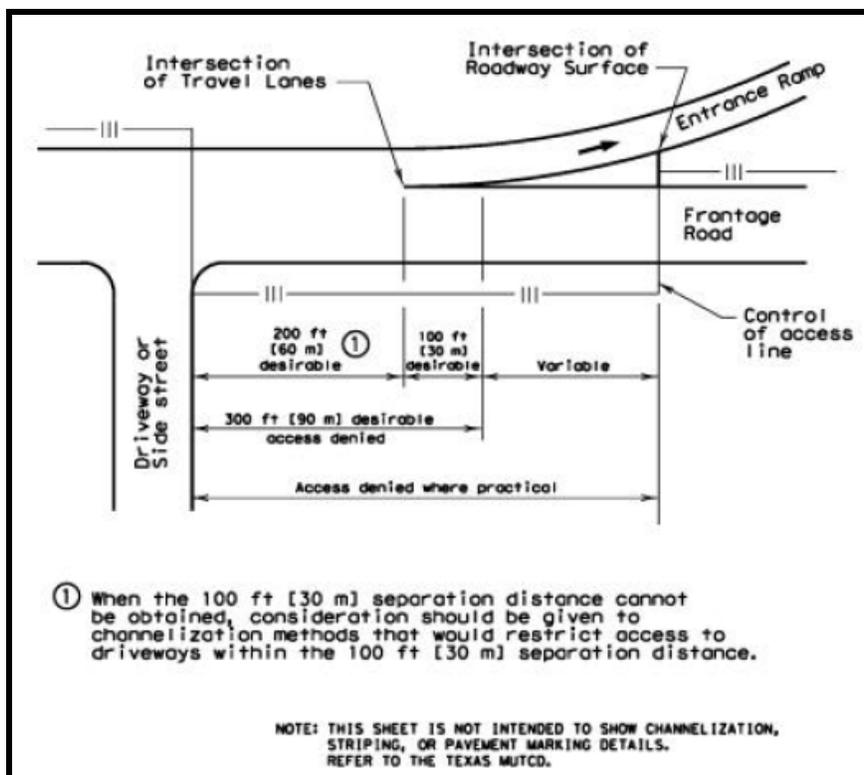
Recommended Access Control at Entrance Ramp Junction with Frontage Road (II).
